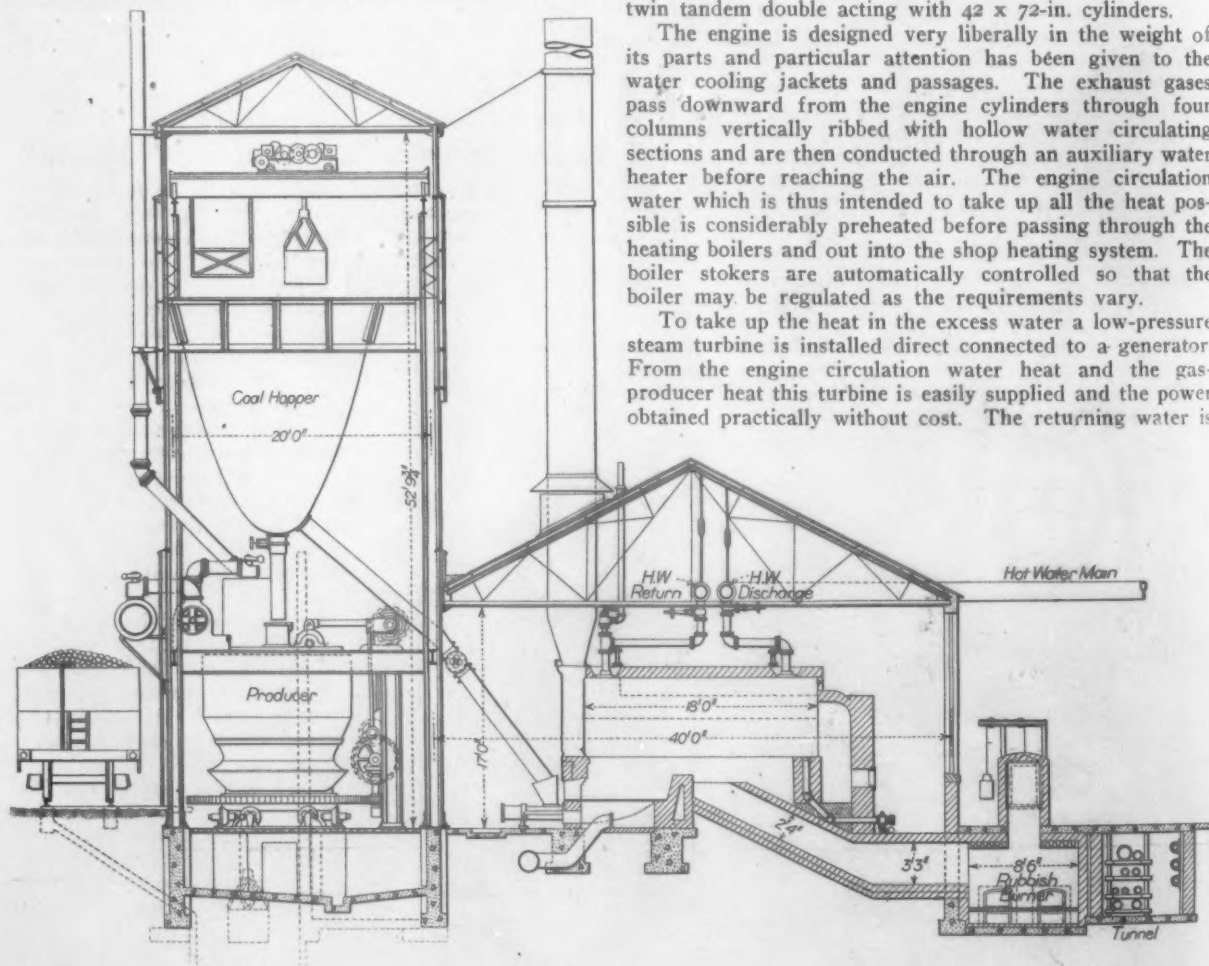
Sectional Elevation Through the Coal Handling and Boiler Plants, Showing the Gas Producers and the Hot-Water Heating Boilers Which May Utilize Coal, Gas from the Engines or Even Heat from a Rubbish Burner
